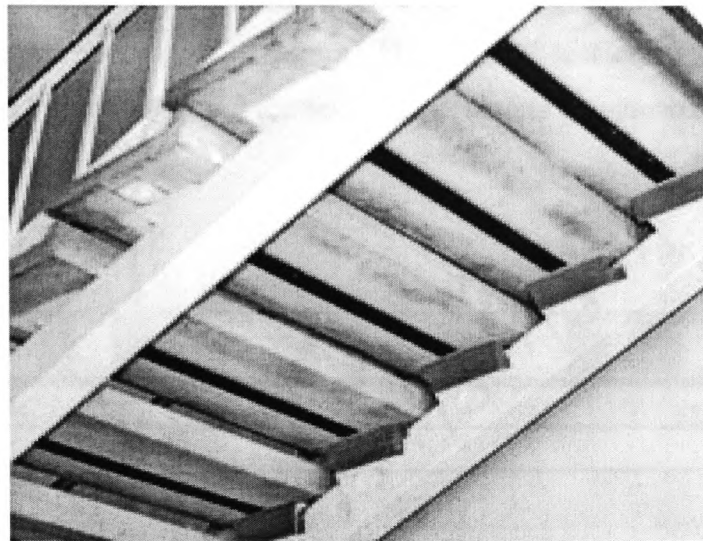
CFRP Strengthening of Concrete Staircases in Yarborough School, Lincoln (Courtesy of Sika UK Ltd)
